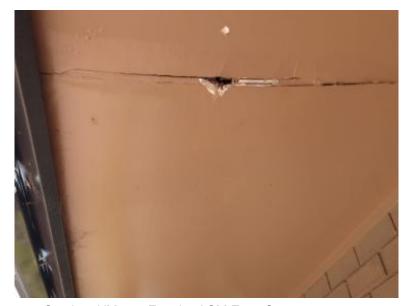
Caption: HM 25 - Exterior ACM Eave System
